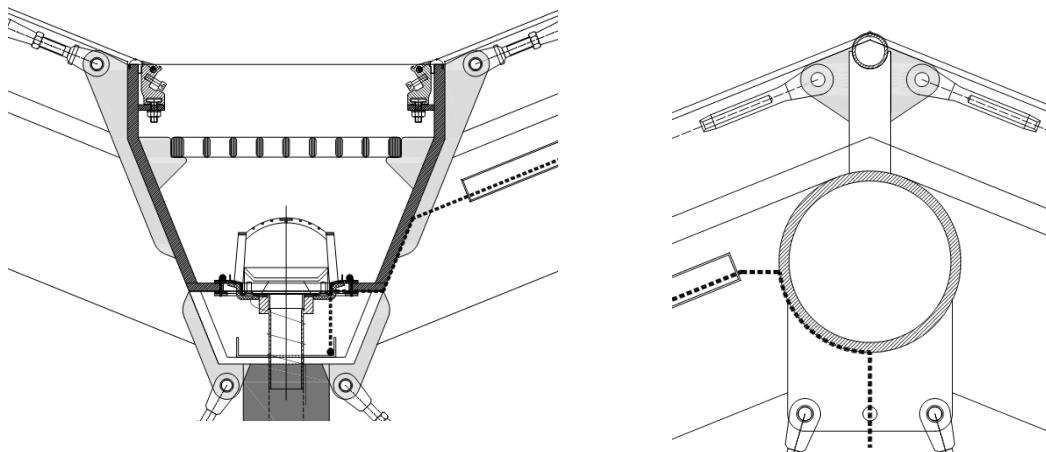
Samples of cable connection details; (left) a gutter detail; (right) a ridge detail. [2]
